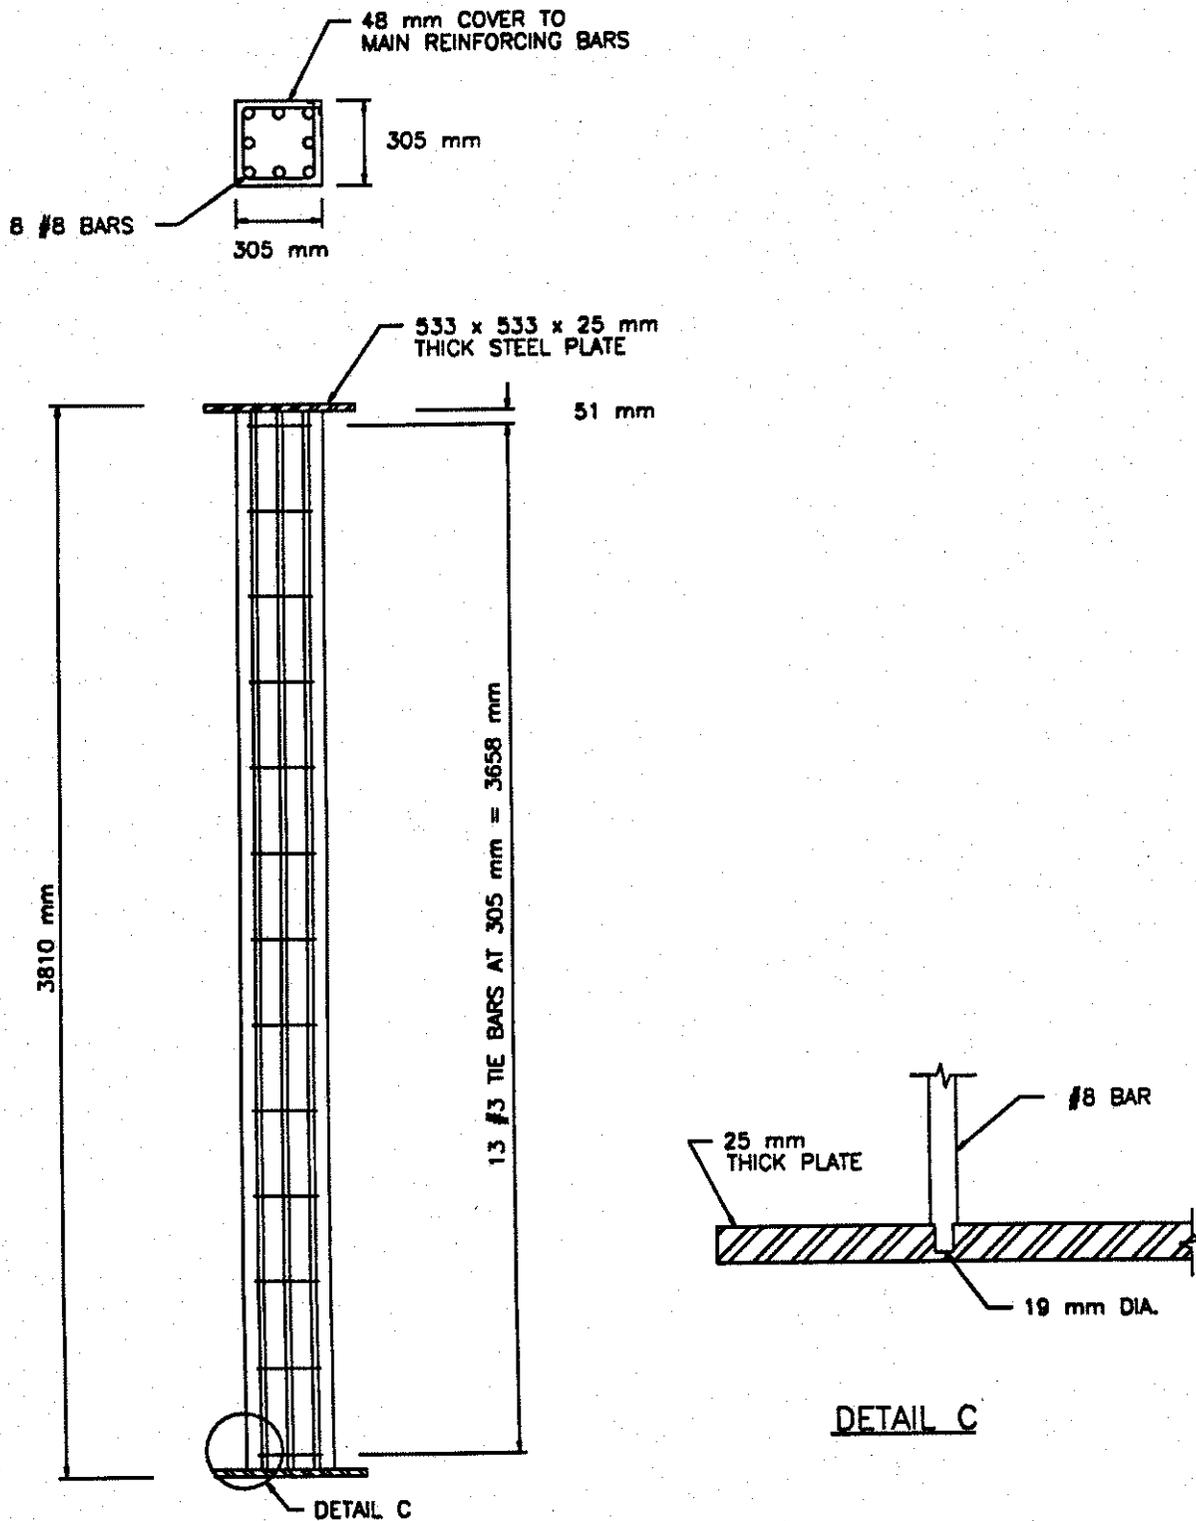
ELEVATION, CROSS-SECTION AND FINISHING DETAIL:
